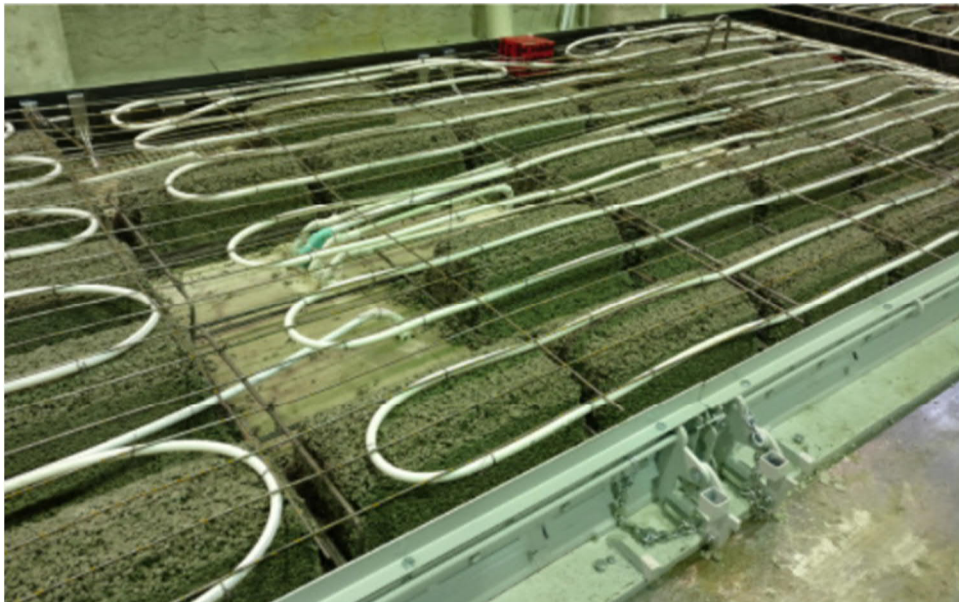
Placing of underfloor heating pipes (Lujabetoni Oy, 2018)
